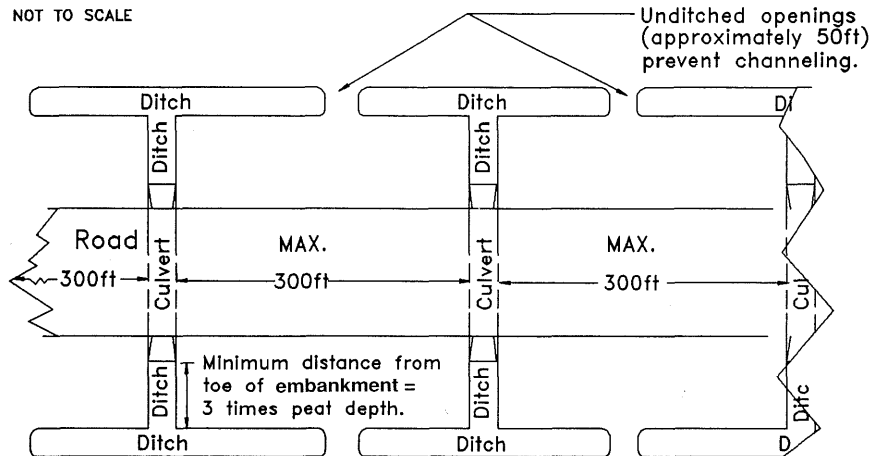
Road Design for Peat Wetlands with Continuous Cross-Drainage
